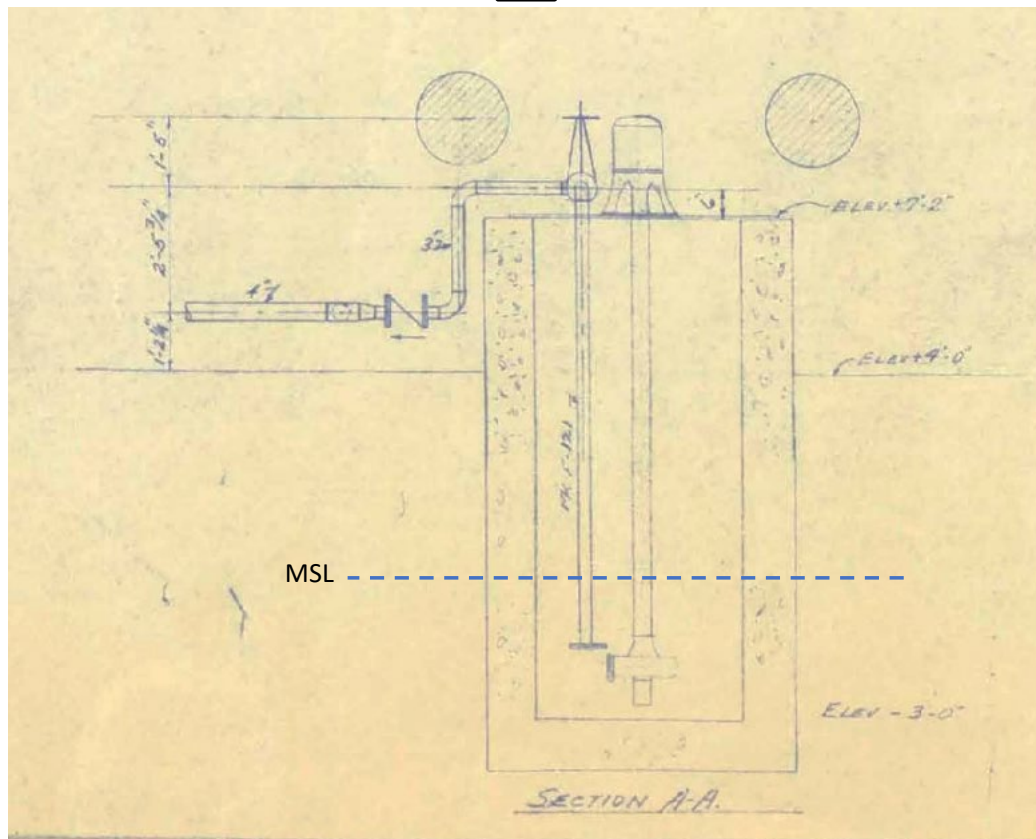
Cross-section of FOR sump in the UGPH, from Y&D Drawing# 294075.
